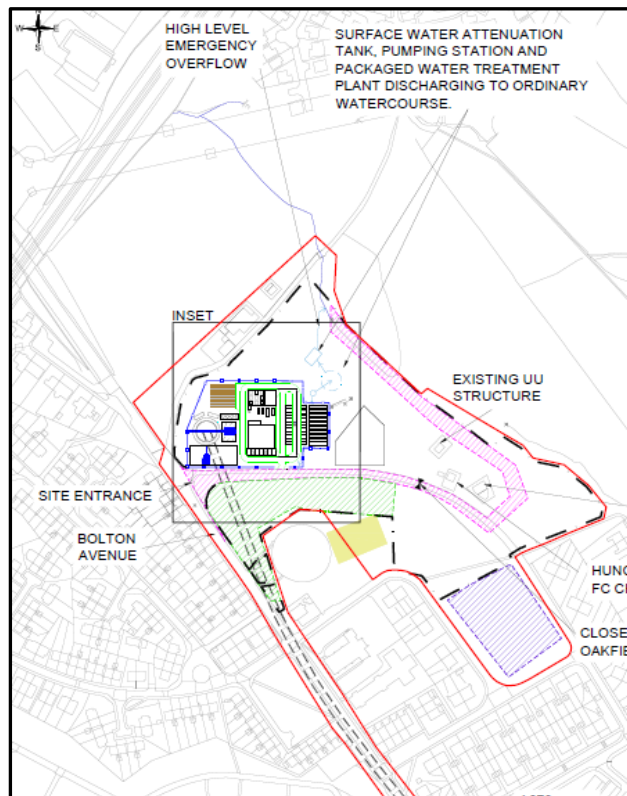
Plan illustrating general location and features of compound at Bolton Avenue.
